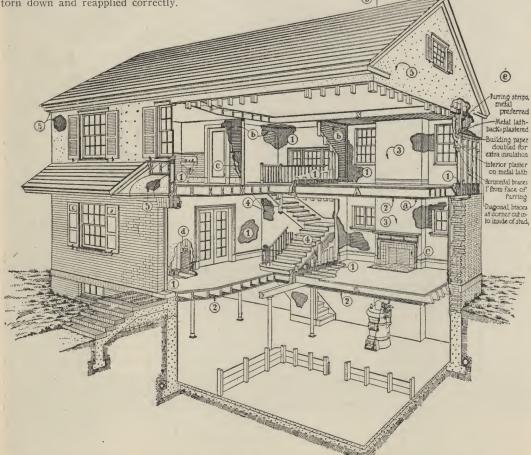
The Numbers 1 to 5 Indicate Where Better Plastering Should Be Used for Fire Prevention. The letters A to E show where better plastering should be used to prevent plaster cracks.
